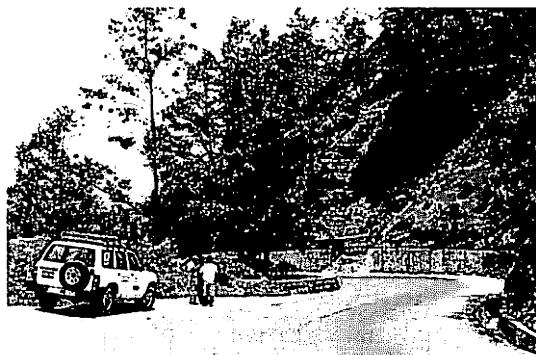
View of the landslide Control Work at Nagdhunga, 12.0km west from Kathmandu.
